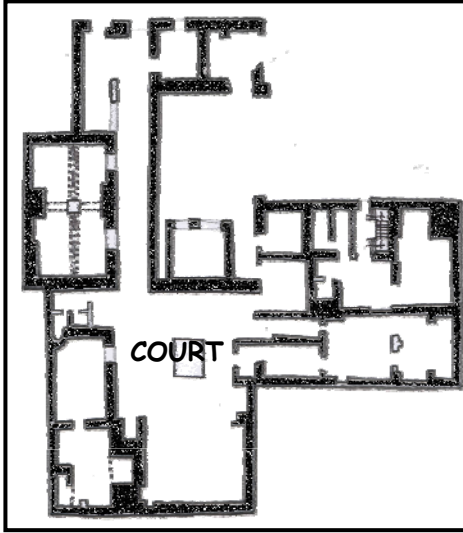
Bayt al-Sinnari (1794): Ground floor plan highlighting the Center Court
